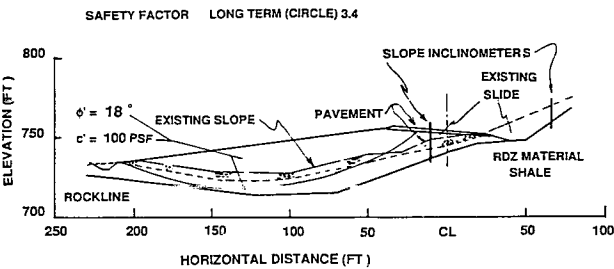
Cross Section of Embankment Located at Herron Hill, Station 1826+00.
